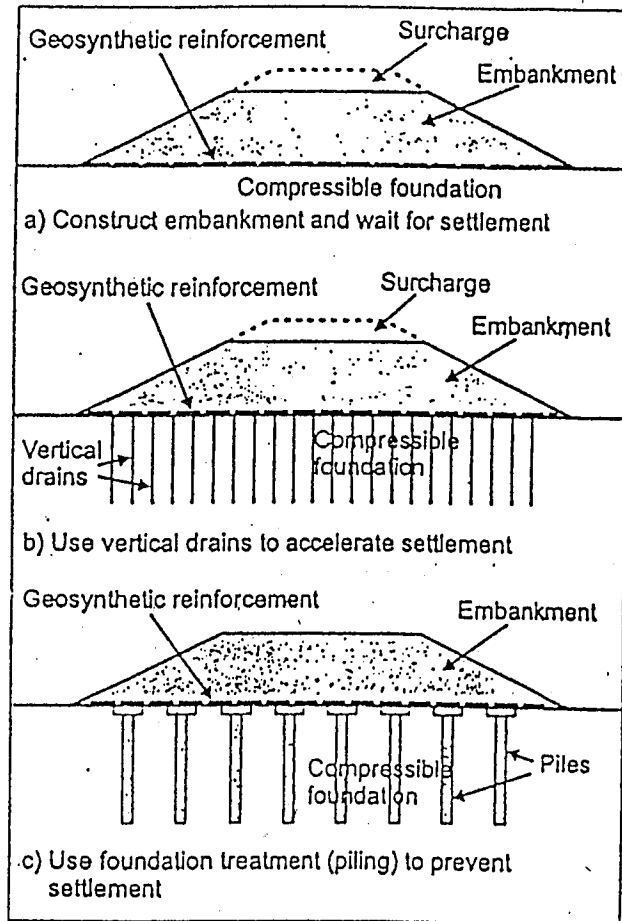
Basal Reinforced Embankment with (a) Surcharge; (b) Vertical Drains and (c) Piles
